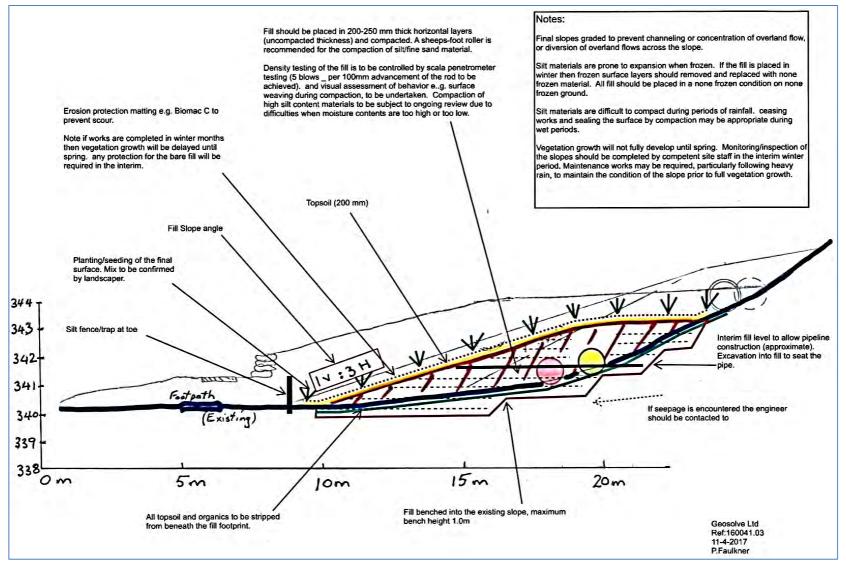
Conceptual Arrangement for Pipeline around Foot of Slope with Geotechnical Notes by Geosolve
